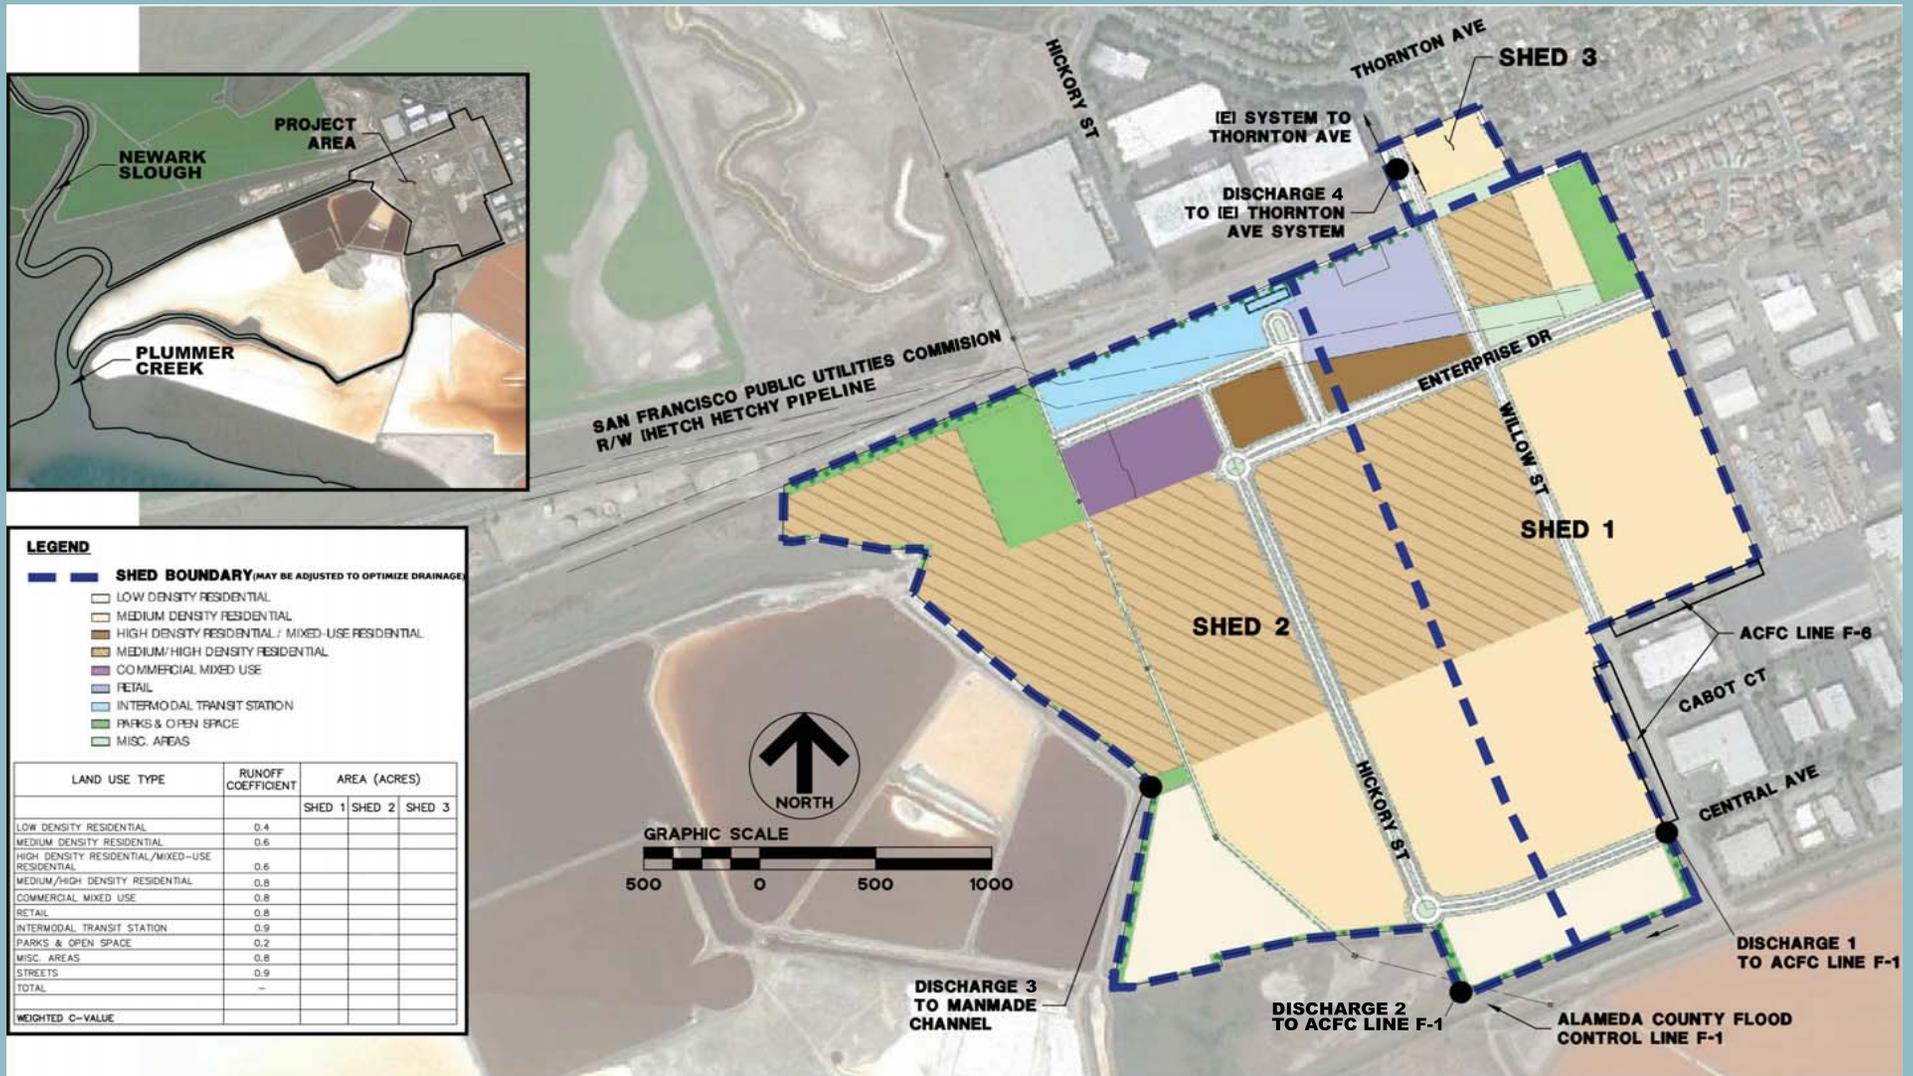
Conceptual Drainage / Shed Plan
